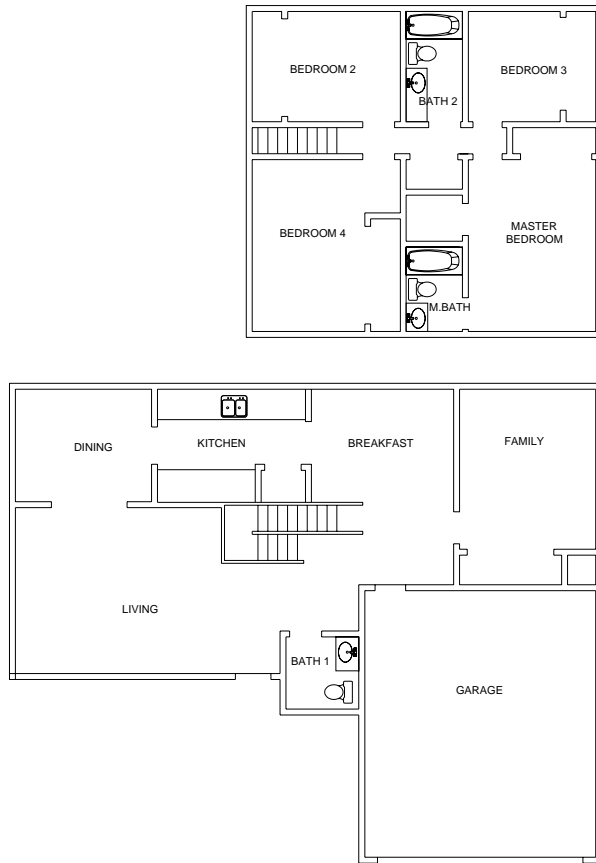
House #7 – Floor Plan (first floor below, second floor above)
